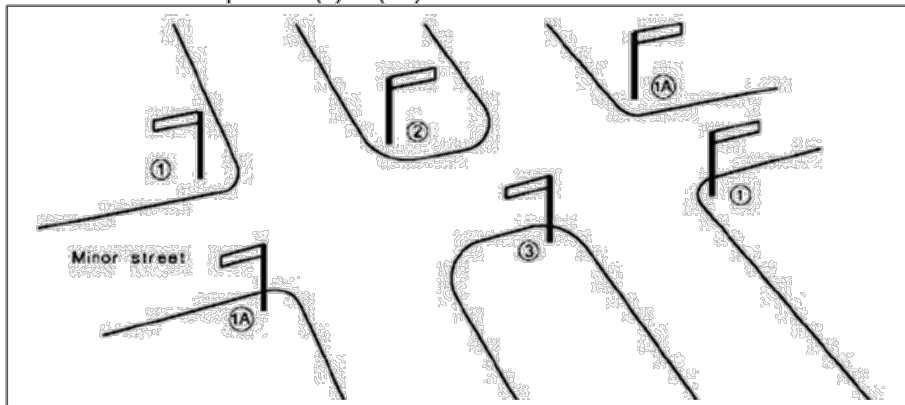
INTERSECTION OF MINOR STREET WITH DIVIDED MAJOR STREET—WITH MEDIAN OPENING
